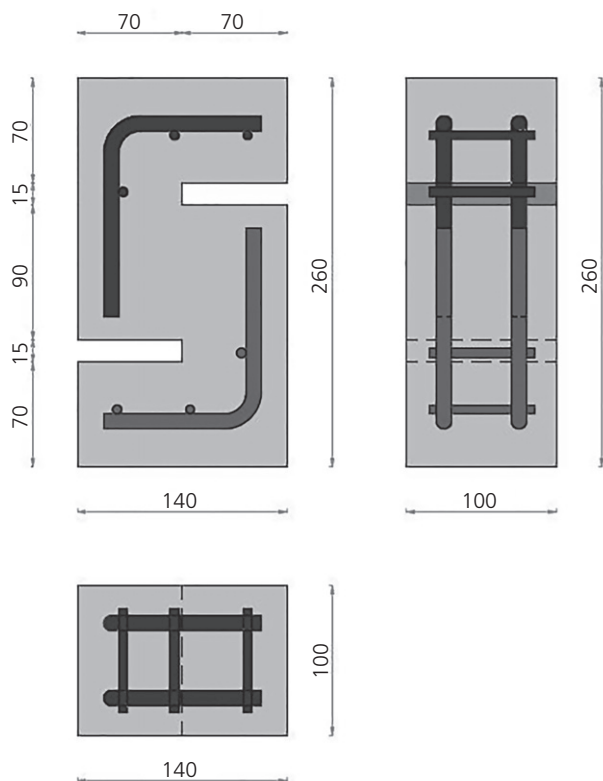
Push-off specimens: geometry and reinforcement details (dimensions in mm)
